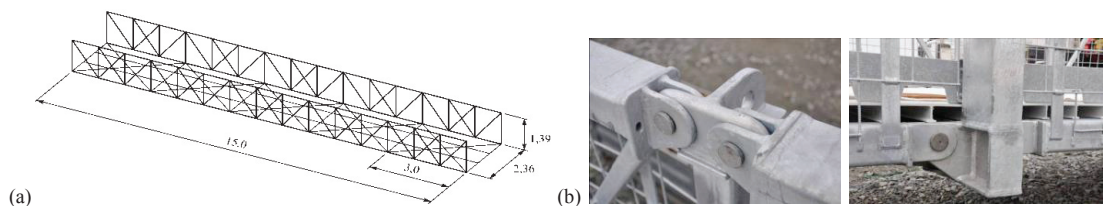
Short footbridge: (a) geometrical composition; (b) typical configuration of assembly connections (upper and lower chords).
